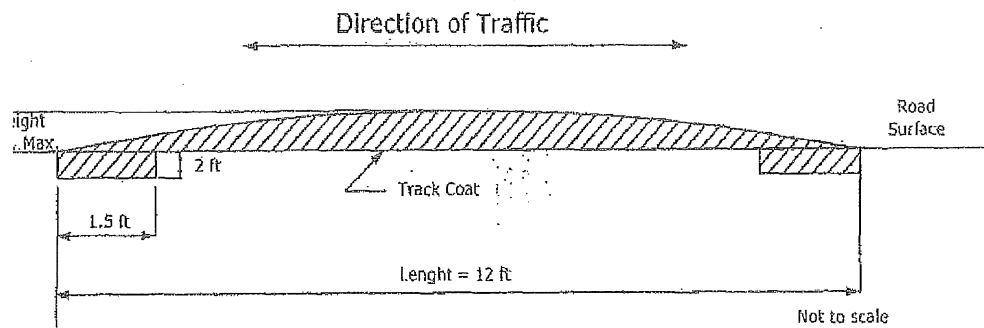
speed Hump construction showing road surface excavation at taper edges to prevent spalling
